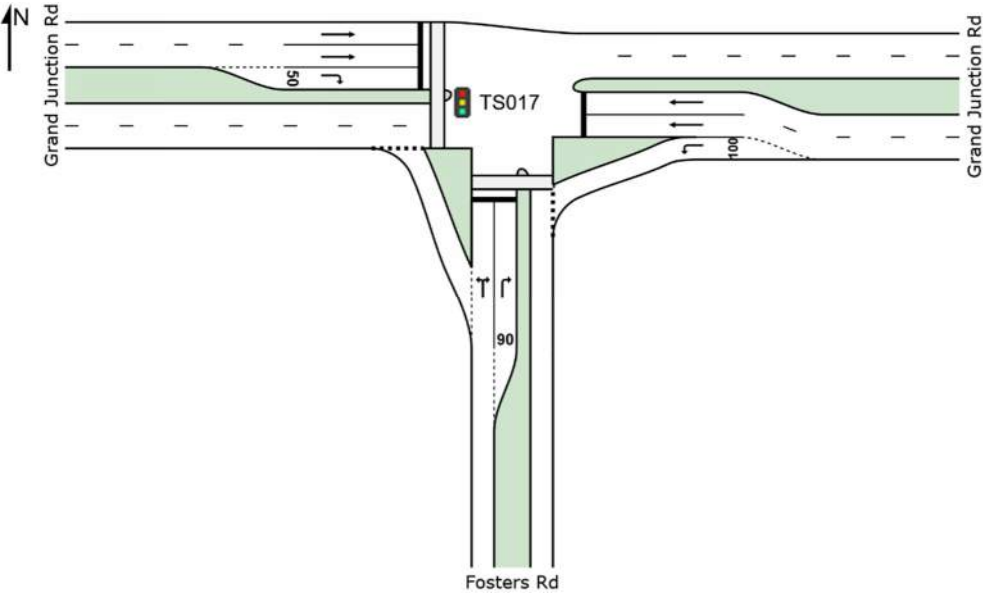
Grand Junction Road / Fosters Road, suggested modified layout
